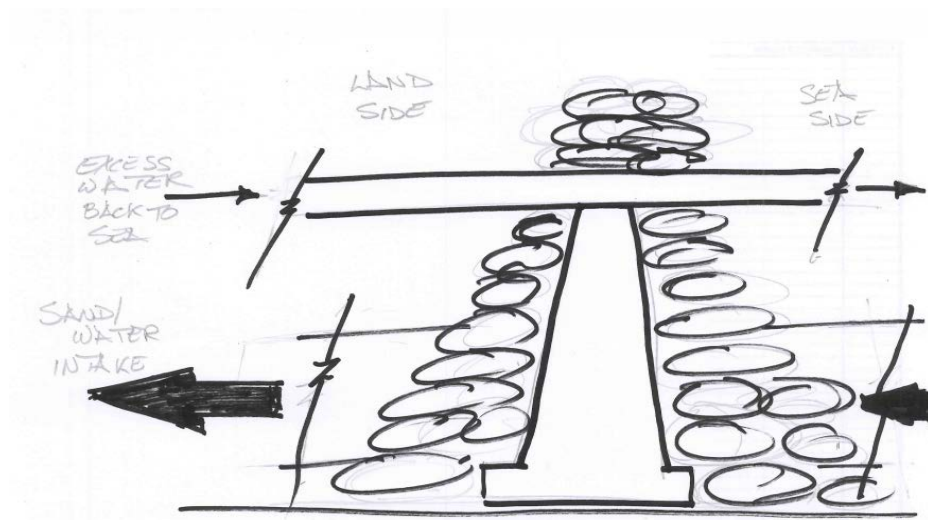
Sectional sketch through proposed wall, showing concrete demountable precast units (complete with hoisting eyes), sand bags and overflow of water
